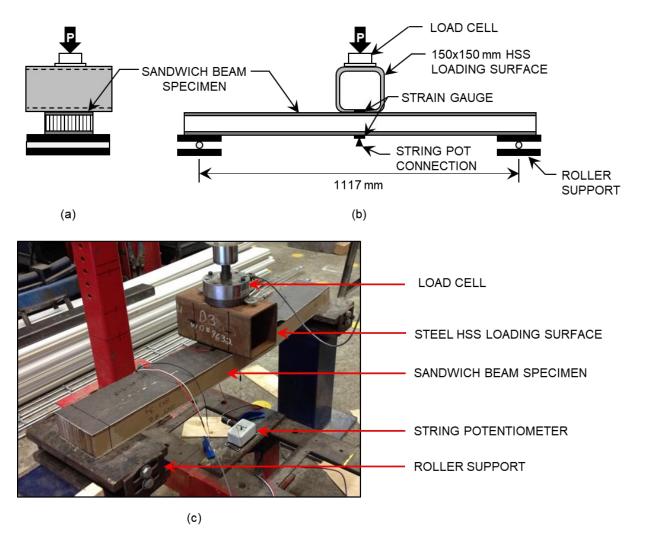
Monotonic Test Set-up (a) End View Schematic; (b) Side View Schematic and; (c) Photo.
